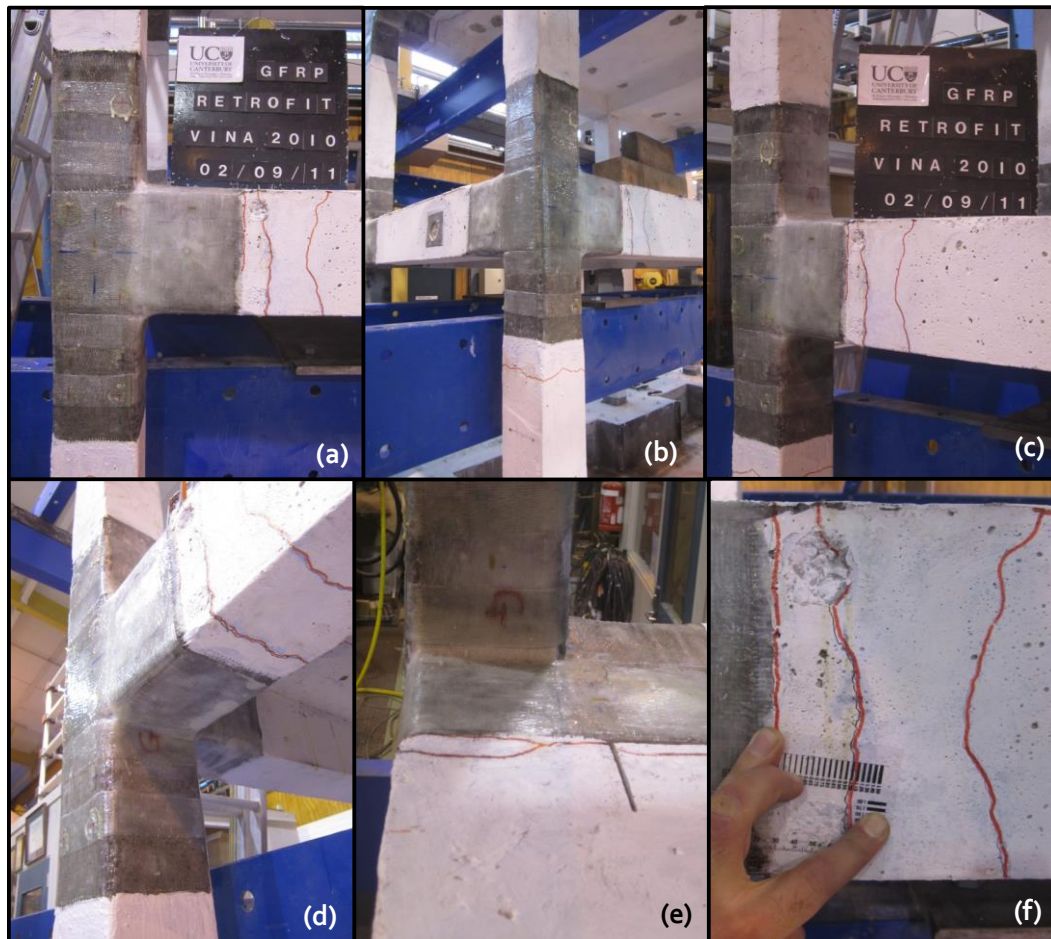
Observed damage after Test 3.2: 1st floor long span corner beam column joint.
